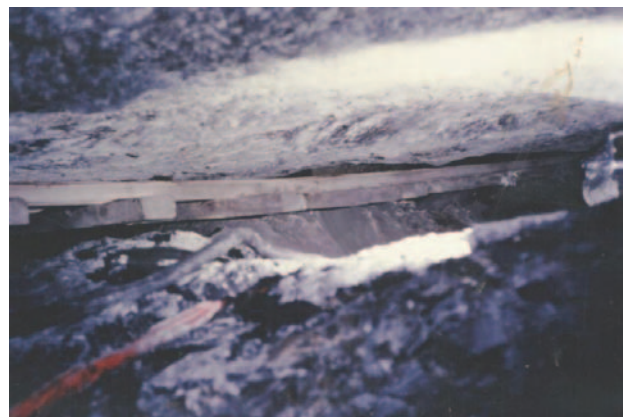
Foundation failure in 4.5m high bord and pillar workings, causing rail track to be pushed up to the roof.
